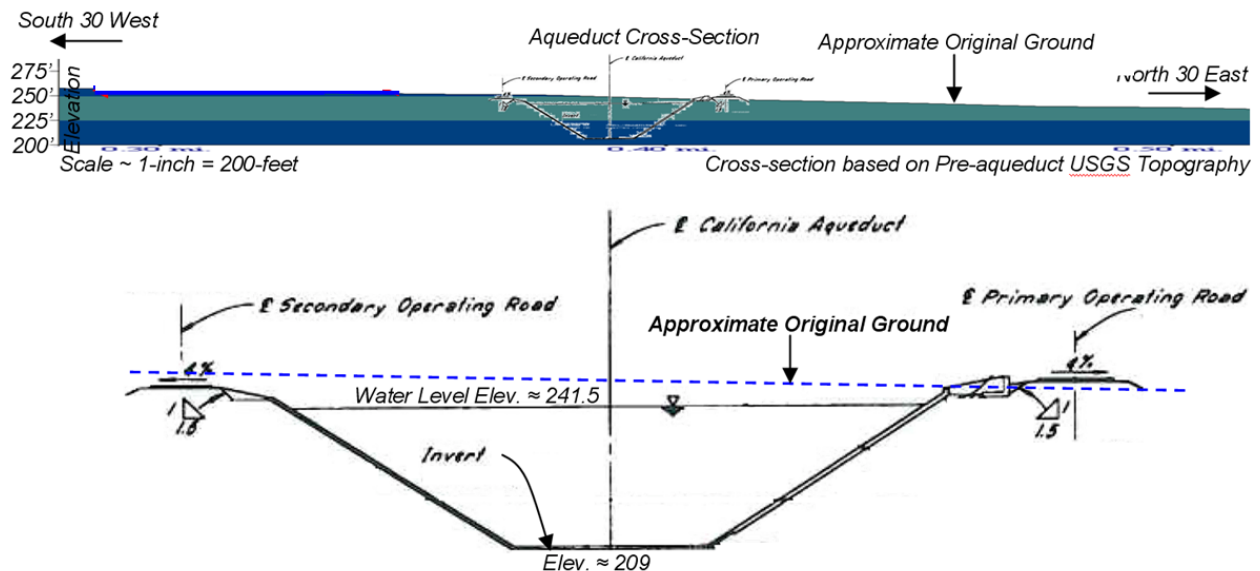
Representative Aqueduct Cross-Section Adjacent to Proposed School Site (CDWR, 1964)
